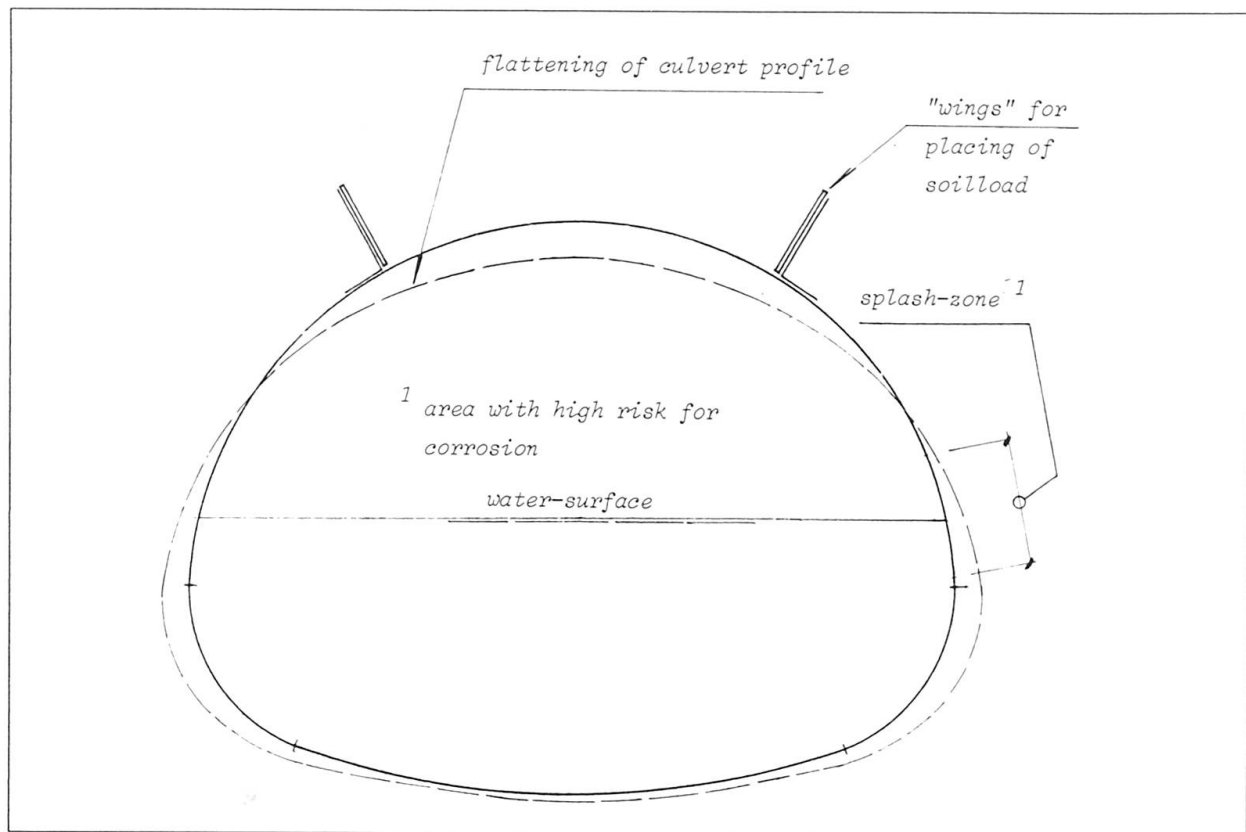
Typical defects of corrugated culverts (flattening of culvert profile and corroded splashzone).
